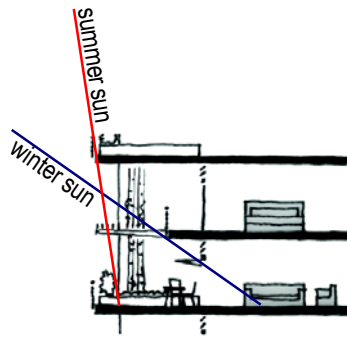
Sunlight entry to building: screen summer sun, admit winter sun to internal spaces.
